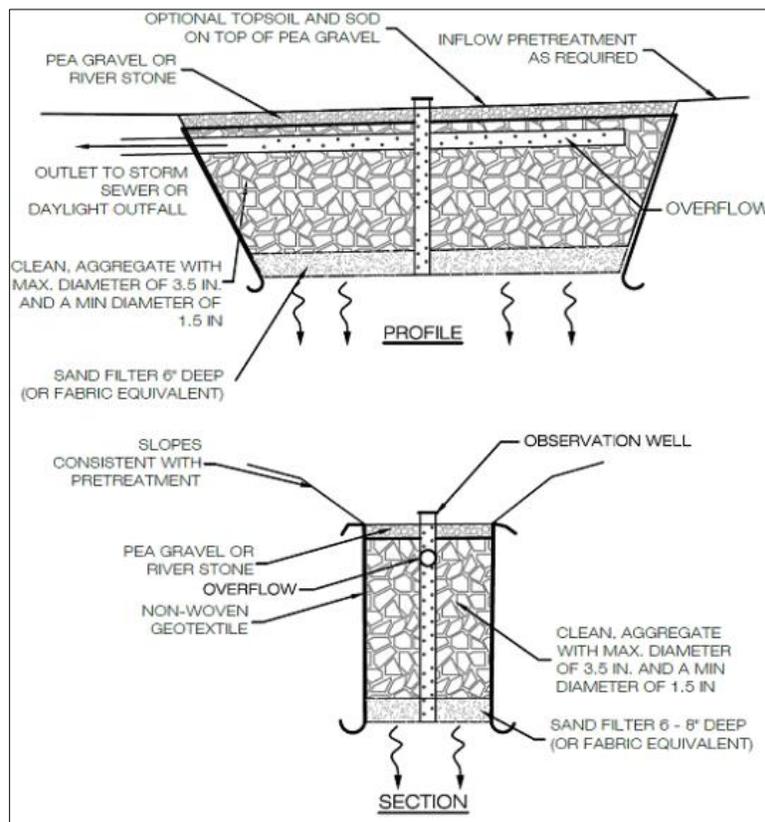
Typical Profile & Section View of an infiltration Trench
